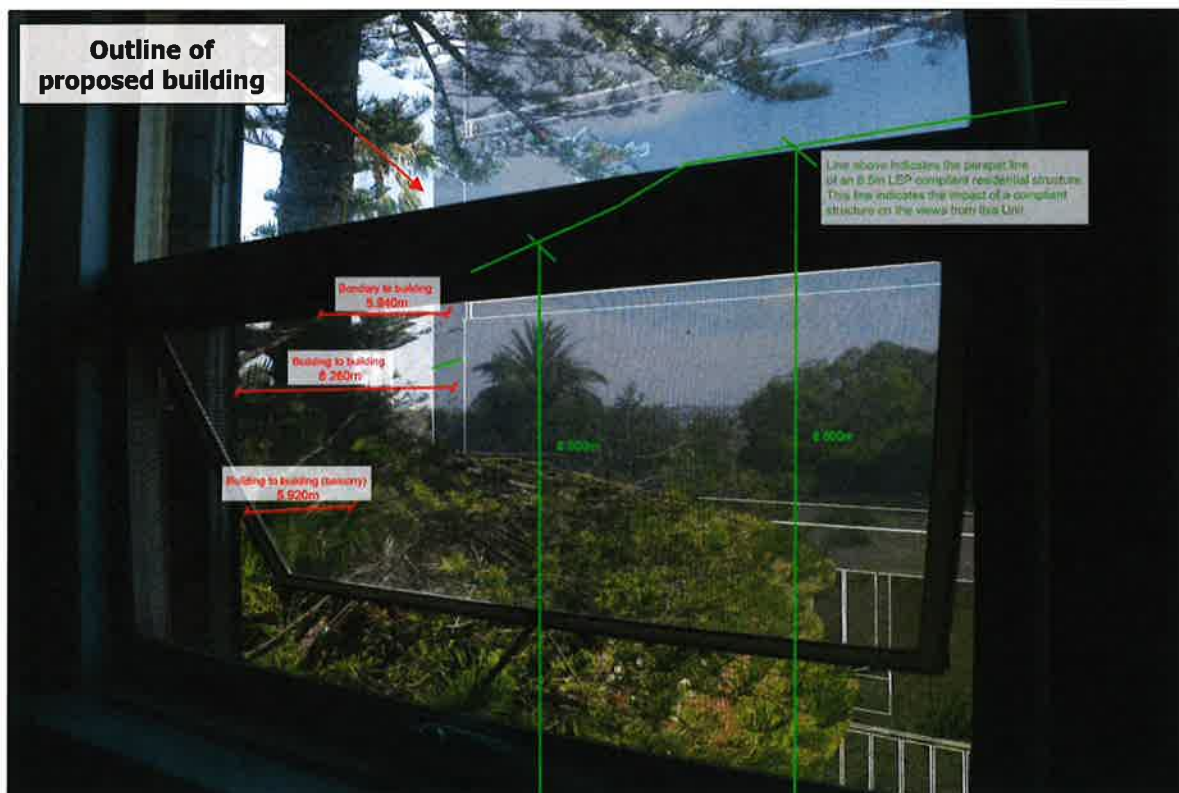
'View 17' from Bedroom of Unit 3, 29B Shirley Road
